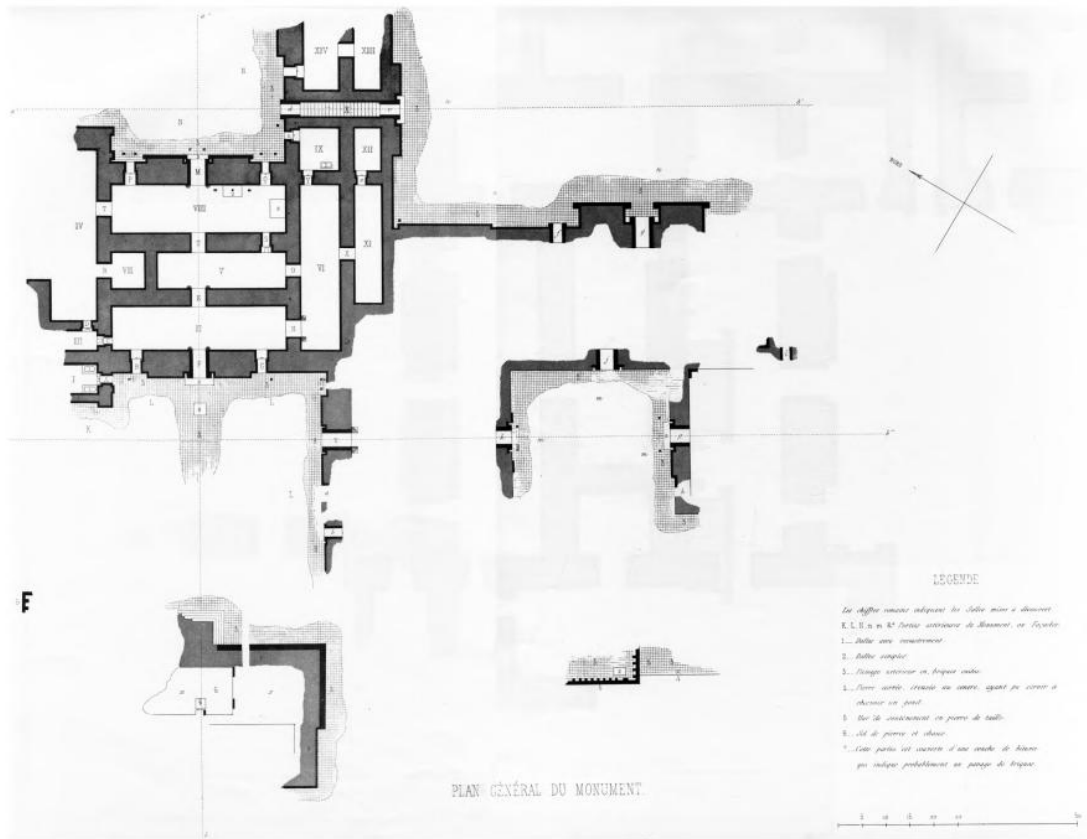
Floorplan of the Royal Palace as excavated by Bottà
